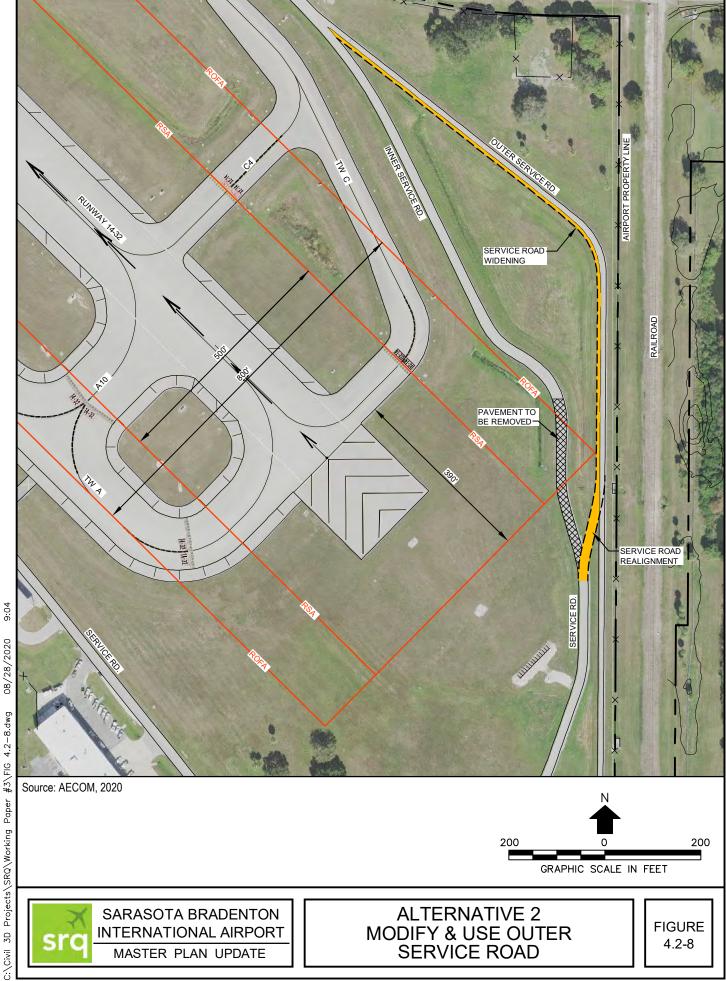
depicts Alternative 2. It consists of widening the outer service road from its existing width of 12 feet to a width of 18 feet (i.e., the same width as the inner service road) and connecting the inner service road to it. This would allow the outer service road to be used in lieu of the inner service road and would include the removal of the portion of the inner service road that is currently within the limits of the ROFA. The length of outer service road requiring improvement is approximately 1,420 feet.
